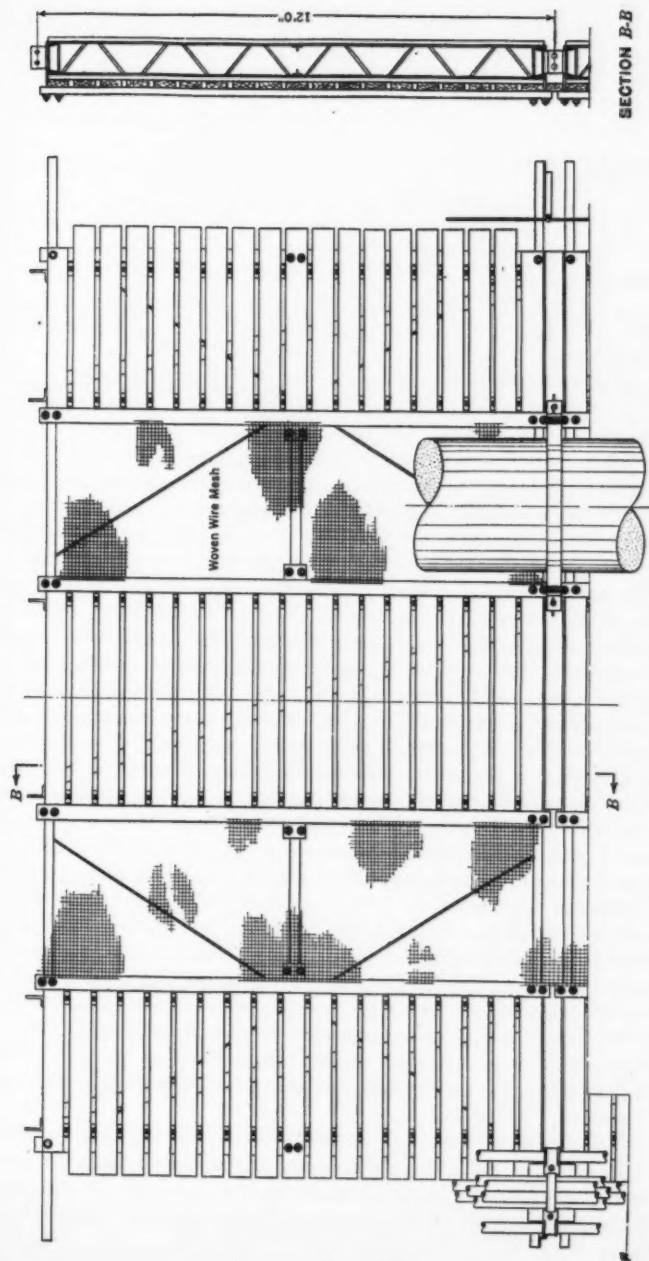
PLAN OF MAIN SPAN FOOTBRIDGE.
